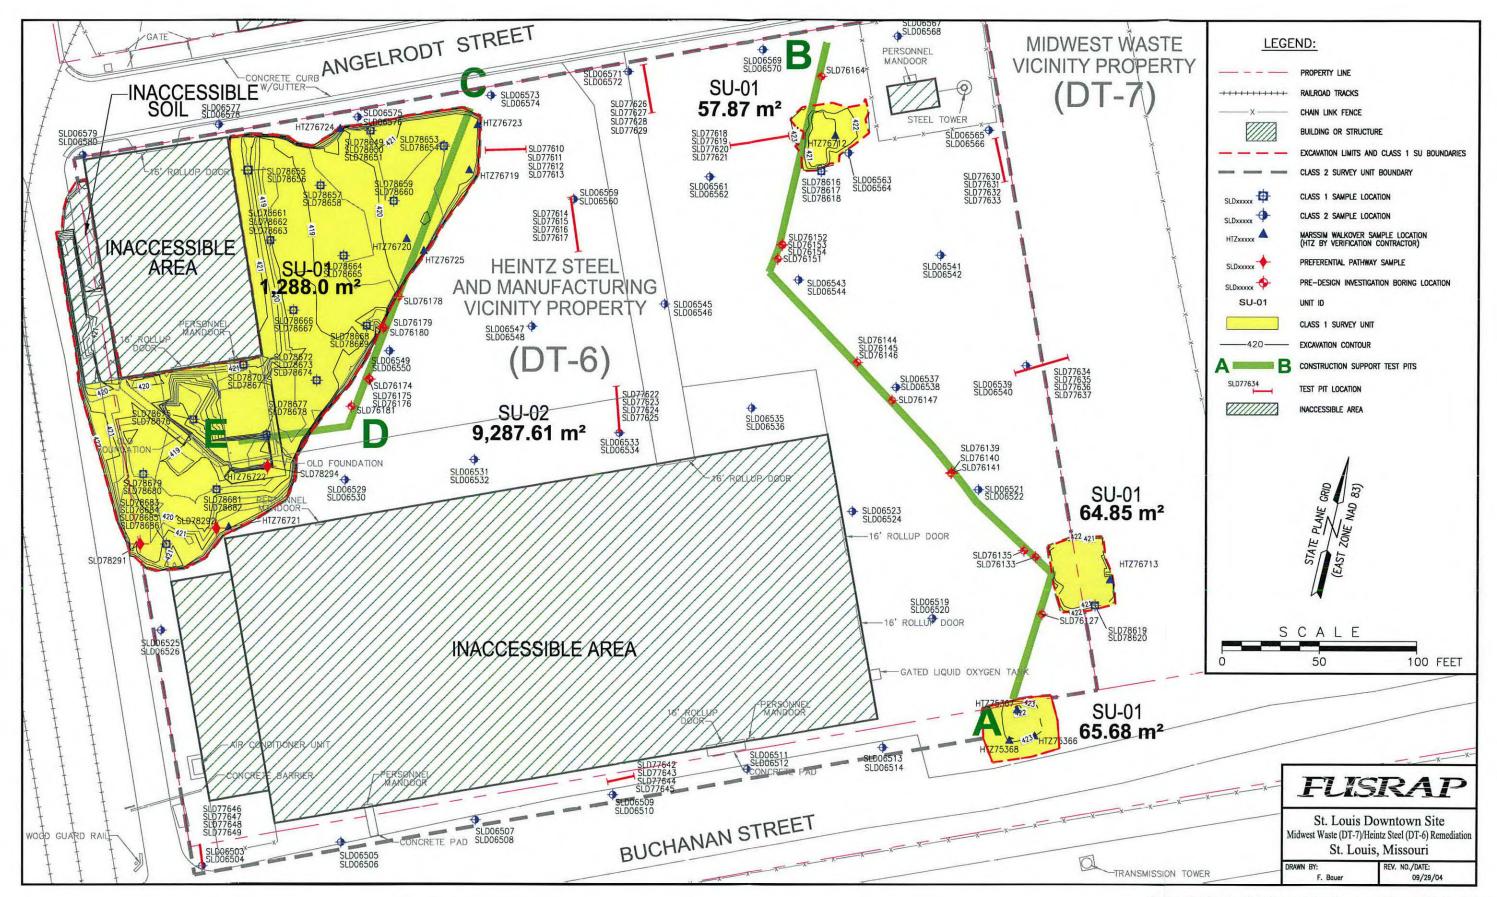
As Built Excavation Areas and Survey Units, DT-6
